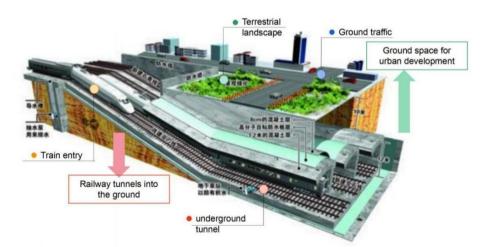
Shijiazhuang Station Railway Runs under the Urban Design
